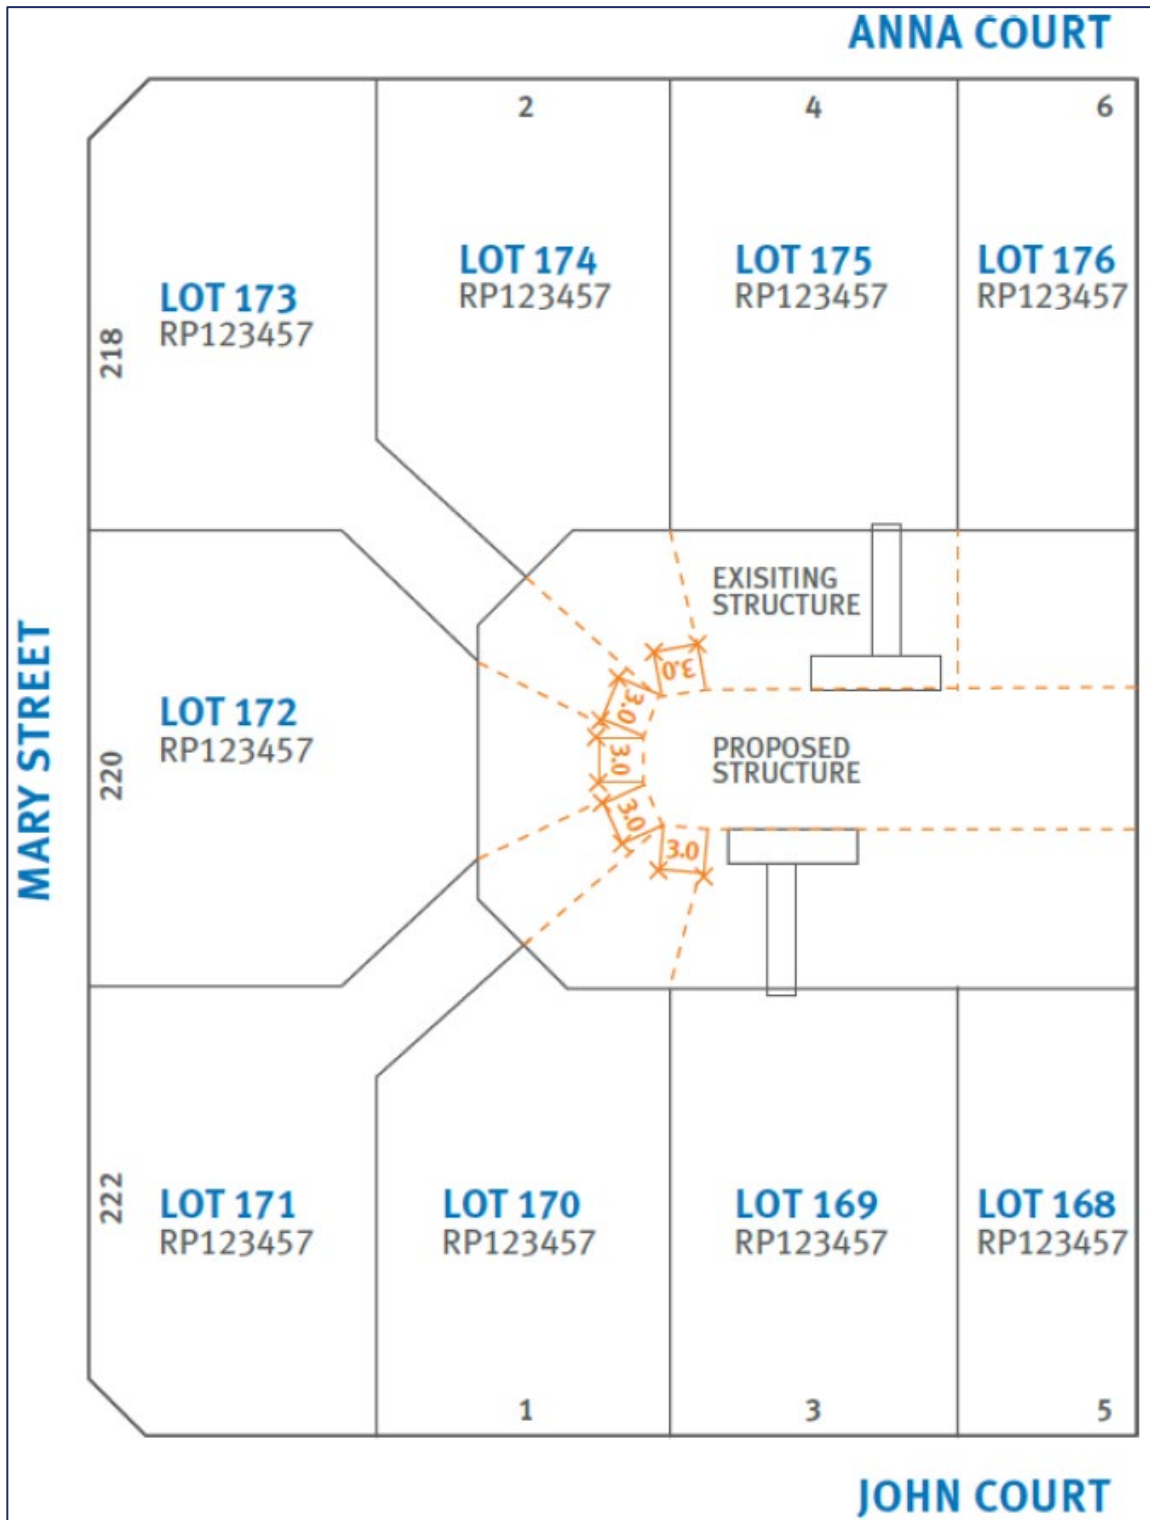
Example of water allocation area plan for cul-de-sac canal (using the guideline published by the Department of the Environment, Tourism, Science and Innovation to establish equitable water allocation areas)
